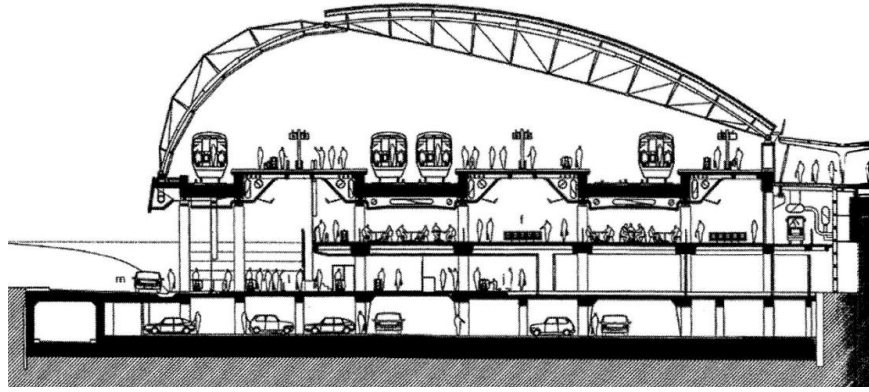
9. Section view showing underground and above ground levels, Channel Tunnel Railway Terminal, London, Nicholas Grimshaw and Partners (Source: Sandaker, Eggen, Cruvellier, 2011)
